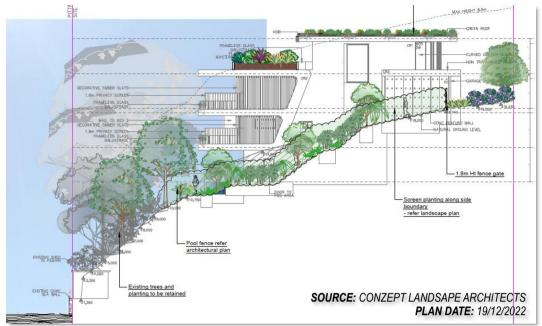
EXTRACT FROM LANDSCAPE PLANS
